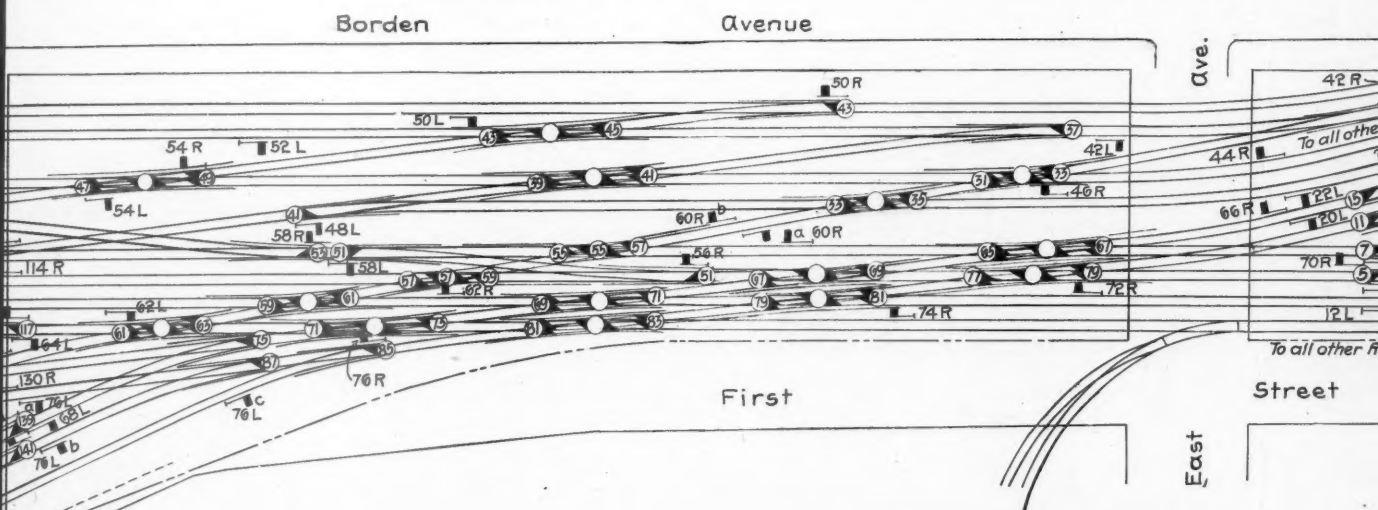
Terminal Passenger Yard, Long Island Railroad, Long Island City, N. Y.—Westinghouse Electric Co. Approximate scale 100 ft. to the inch.
